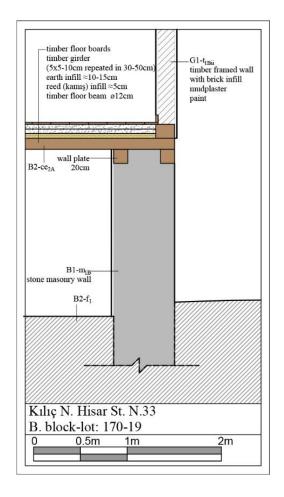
Drawing of flooring (Type 2) in the ground floor of house with basement (Kılıç N. b.block-lot:170-19)
